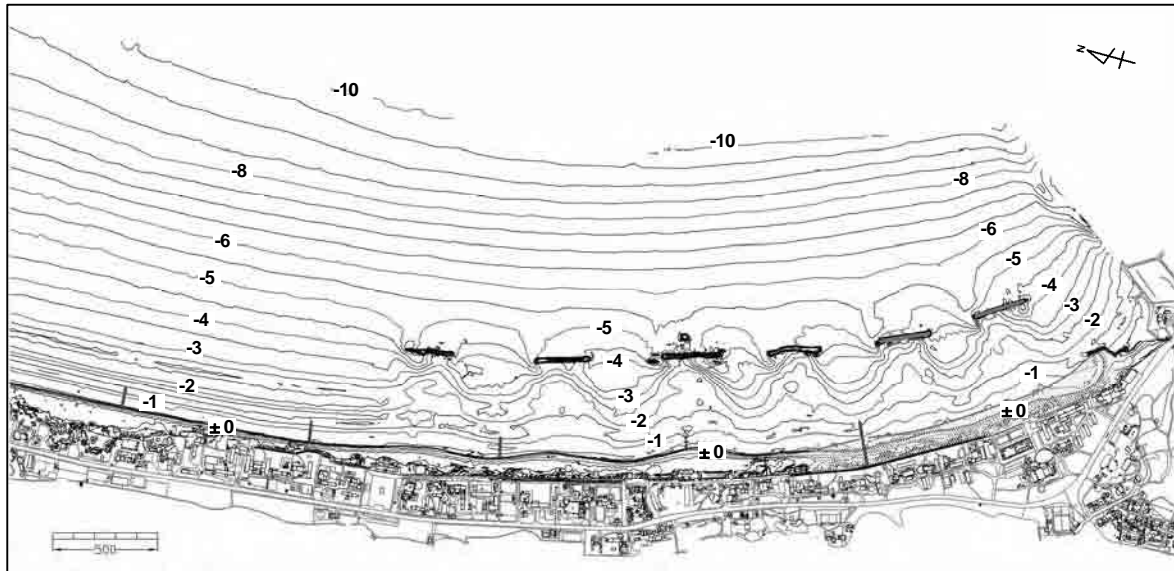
Revised facility layout with river sand at Mamaia Sud
